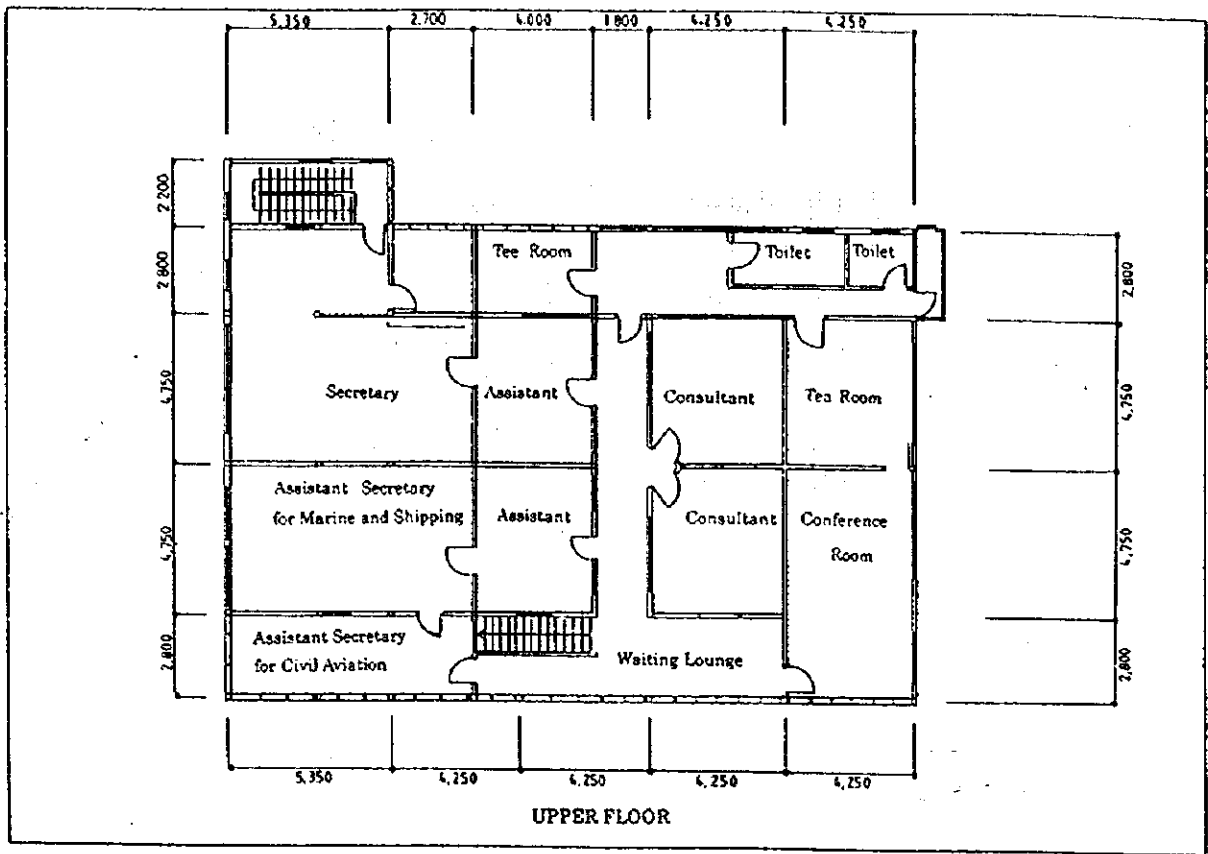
Floor Layout of Exiting MOT Office
